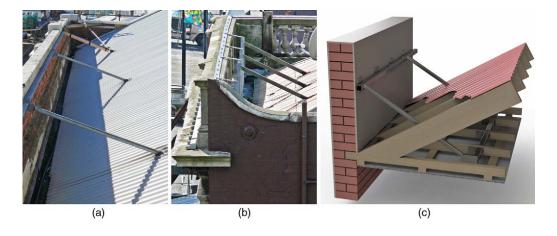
Examples of parapets braced back to structural elements: (a) typical braced parapet; (b) parapet braced back with top connection; (c) design scheme.
